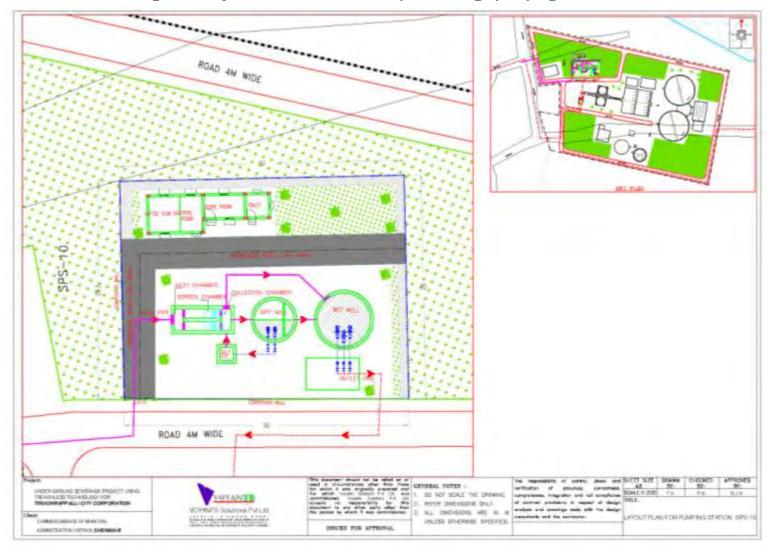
Layout Plan on Revenue Map for Sewage pumping stations 10
